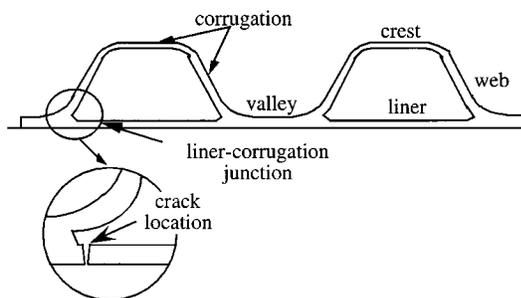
Schematic diagram illustrating the location of circumferential cracking in Type S pipes.
